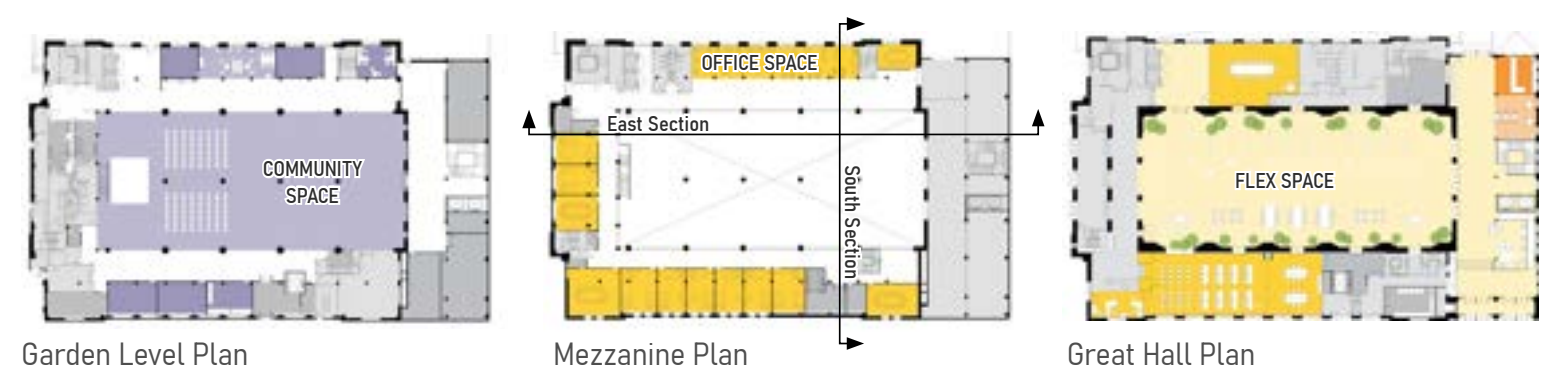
Union Station Floor Configurations. Conceptual floor plans of the Union Station building showing possible reconfigurations for community focused uses.
